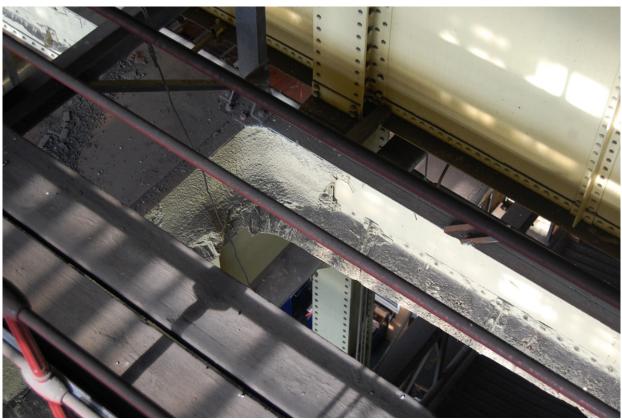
Building 21A: Evidence for former coal hoppers, Bay 5.
